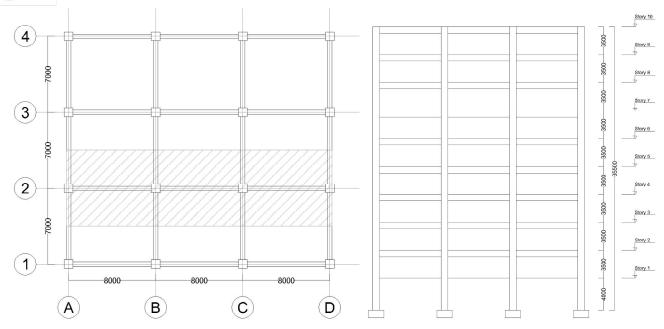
Structural Configuration of Prestressed Concrete Frame
